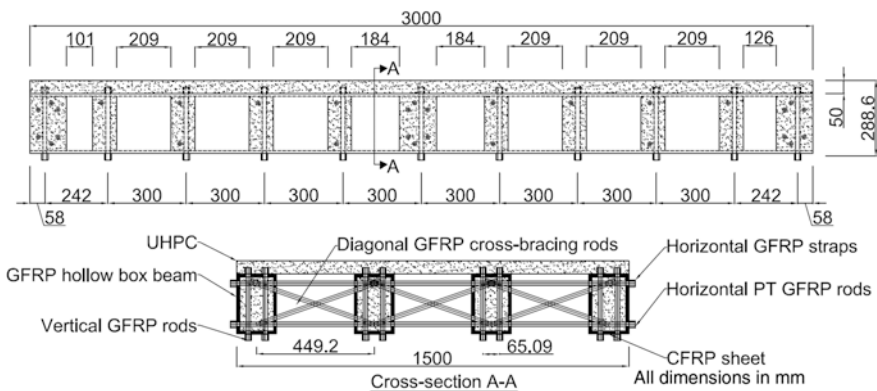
Detailed design and dimensioning of hybrid bridge deck system [5]
